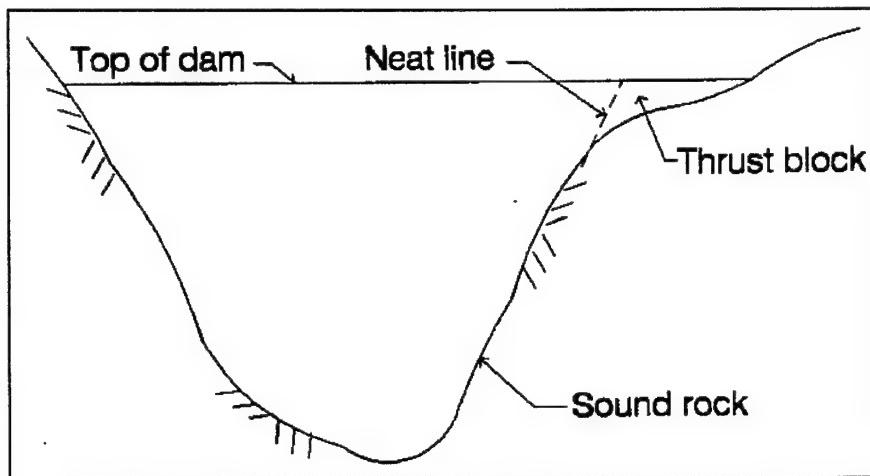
Schematic elevation of simple thrust block as a right abutment extension of an arch dam
